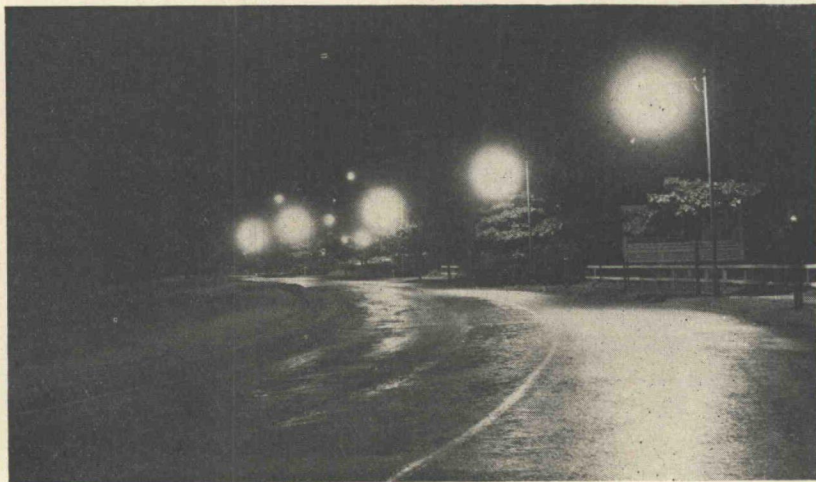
Efficient Light Application 6000 Lumen Lamps—20-Ft. Mounting Height—151-Ft. Linear Spacing. 6-Ft. Bracket. Asphalt Pavement. Note how the specular reflection practically covers the entire traveled roadway.
